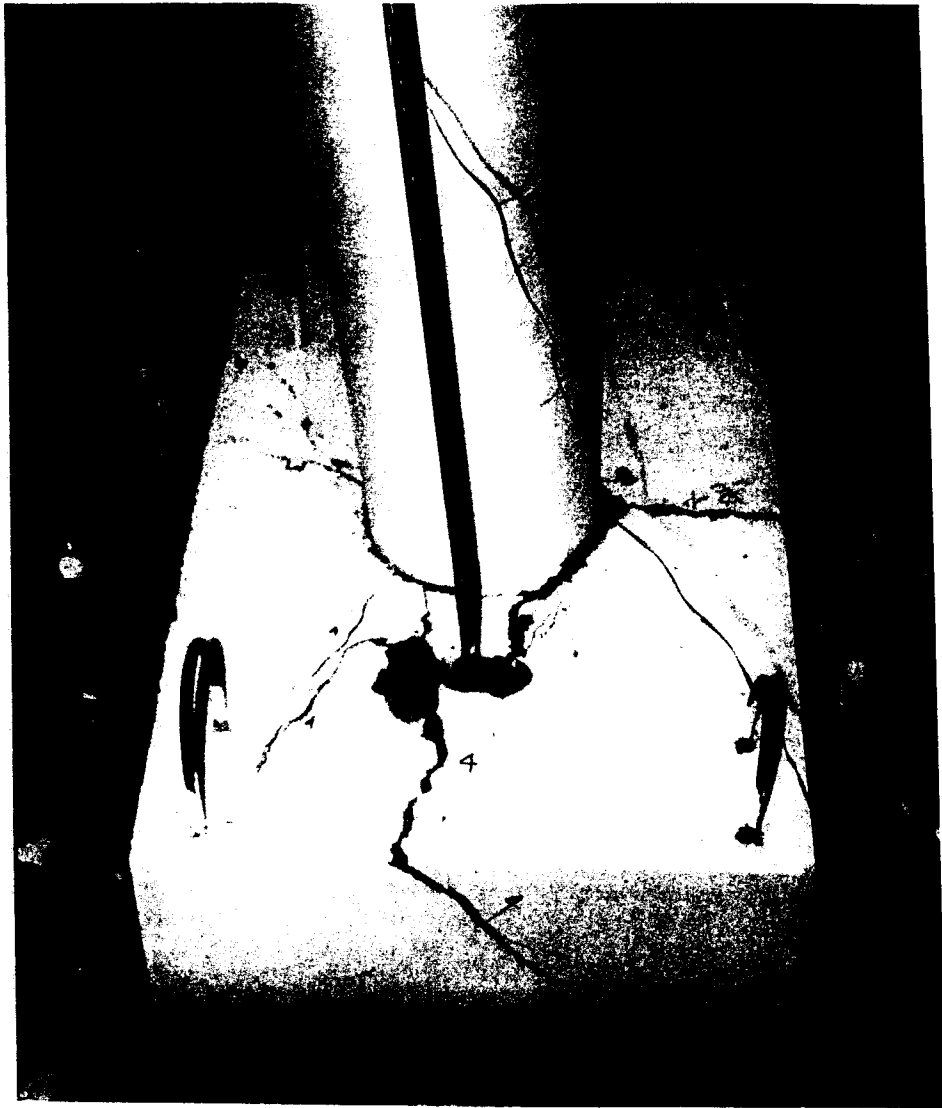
Cracking in the footings of Specimen No. 2.
